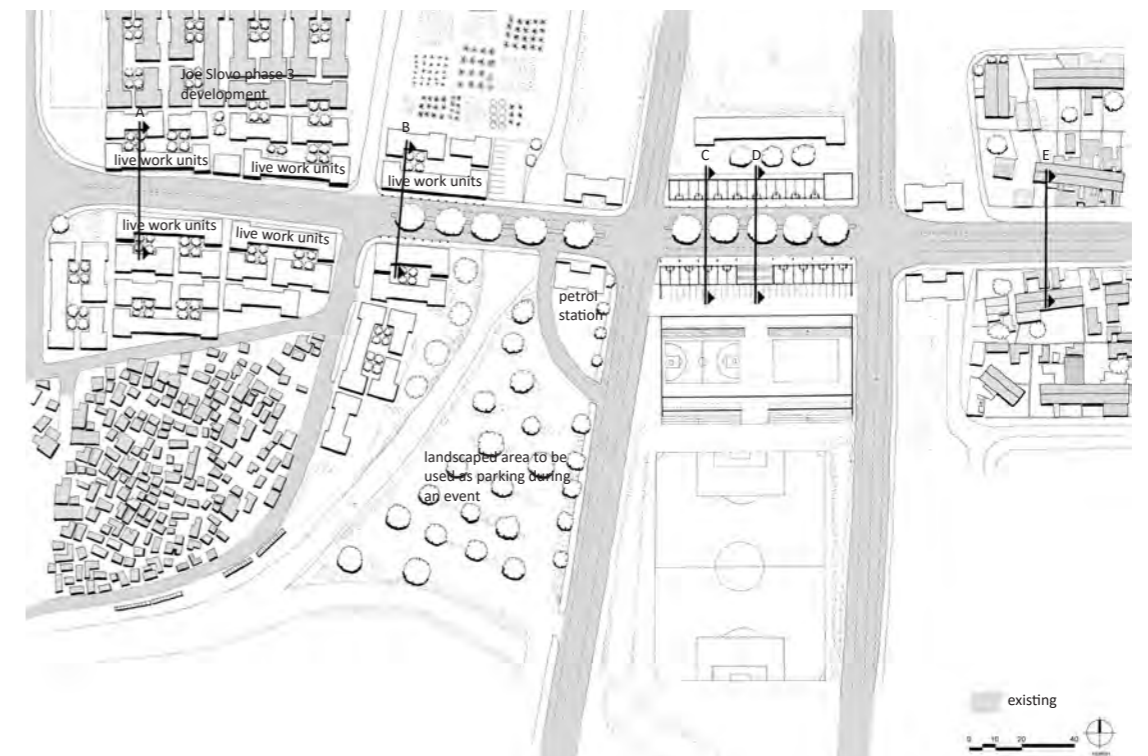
Plan locating the sections above through various points across the street. (Design superceded).
